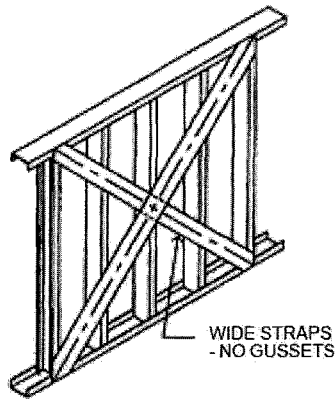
Strap Bearing Wall (LGSEA 2001b)
